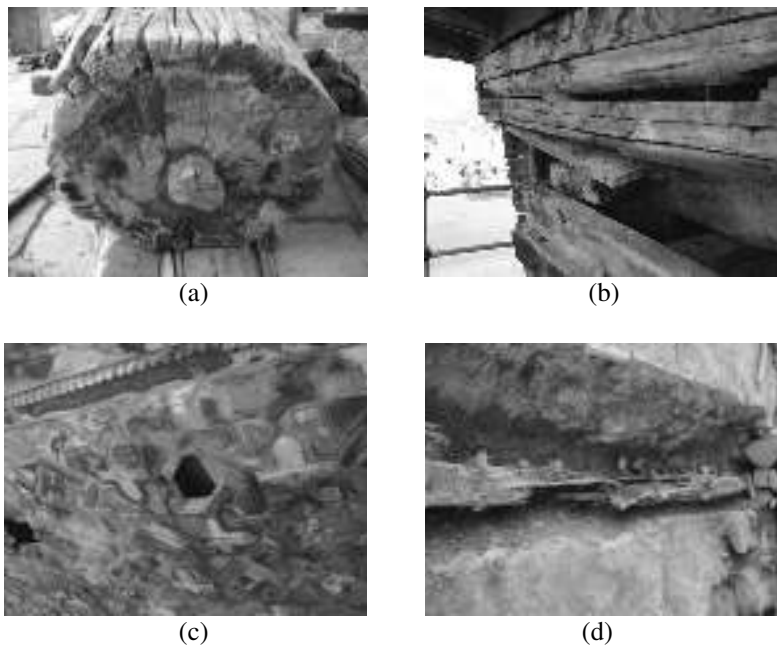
Damage to wood in Ali Qapu building, Isfahan (1597-1668 A.D.): (a) ageing, (b) moisture, (c) air pollution; (d) insect
